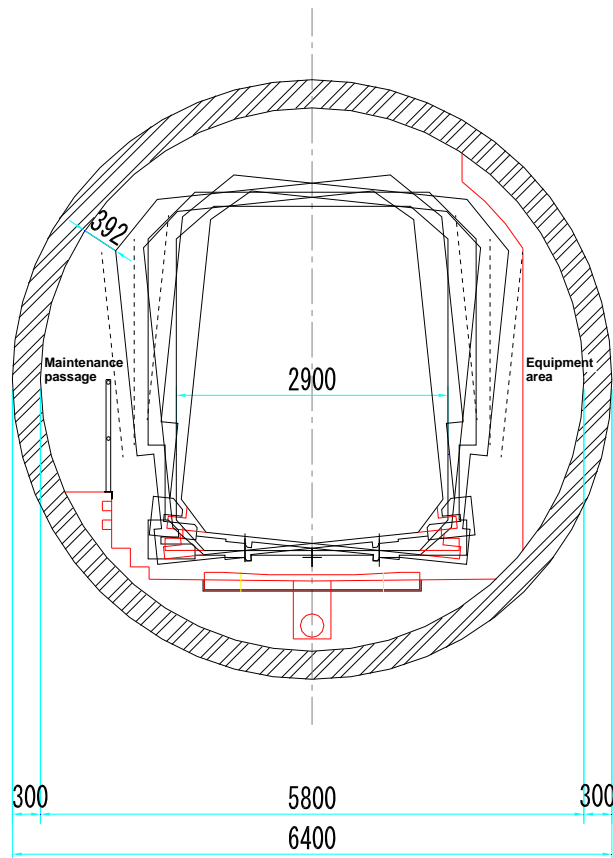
Cross Section of Tunnel based on the 3rd Rail System
